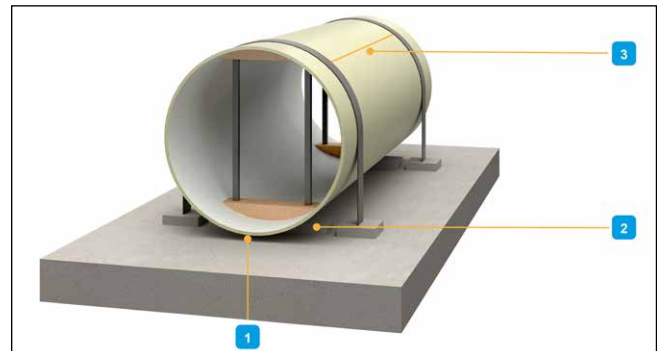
Pipe anchoring—maximum spacing of straps. See Table 11
